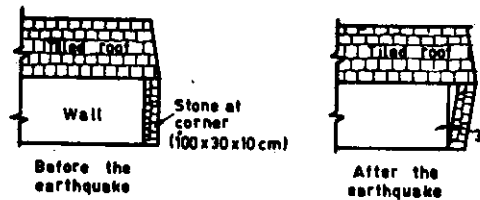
Cracks in the wall of a flour mill in Kowthalam.
